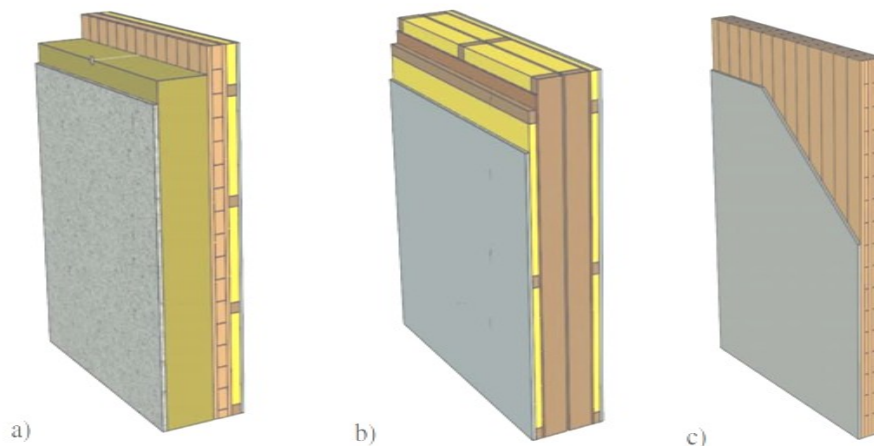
Case 4 - a) Exterior wall, b) Separating timber framed wall, c) Interior partition wall
